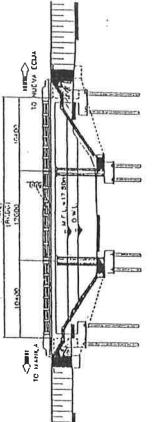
General Elevation Schemes of the Proposed Bridges Along the Plaridel Bypass Alignment
